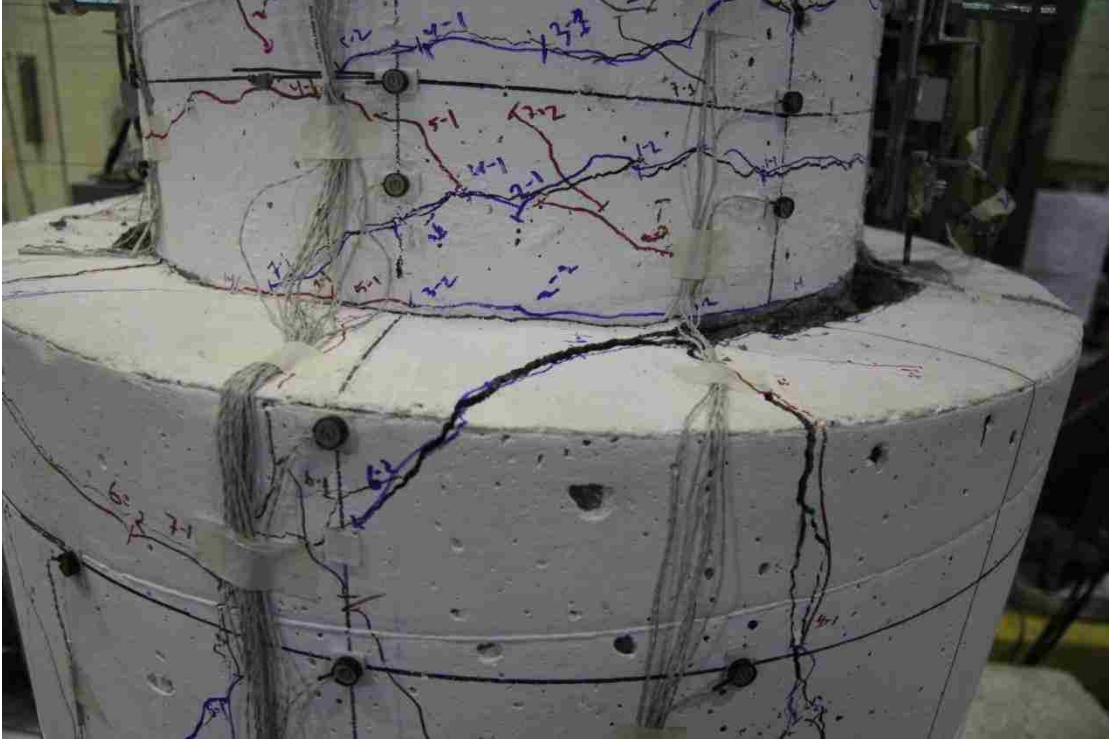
DS-2 – Shaft damage when first shaft spiral fractured in Cycle 8-2 (4.59/-4.59 percent drift)
